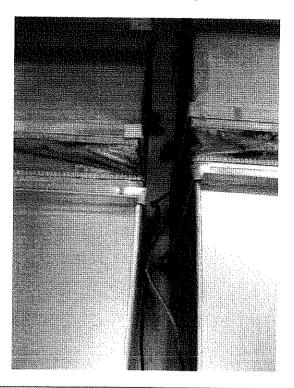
View of wall behind ductwork in the mechanical room. Note: Visible fungal growth and debris from inside supply duct that has impacted on the wall.
